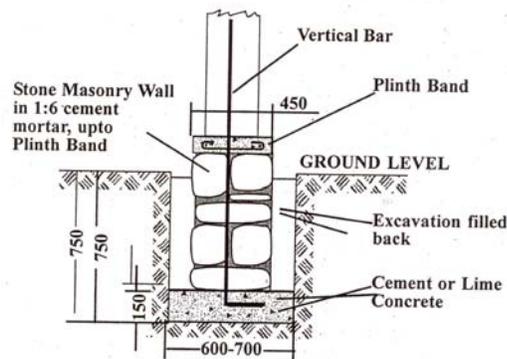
Section view of strip footing with unreinforced concrete as base layer (after GSDMA [8])
